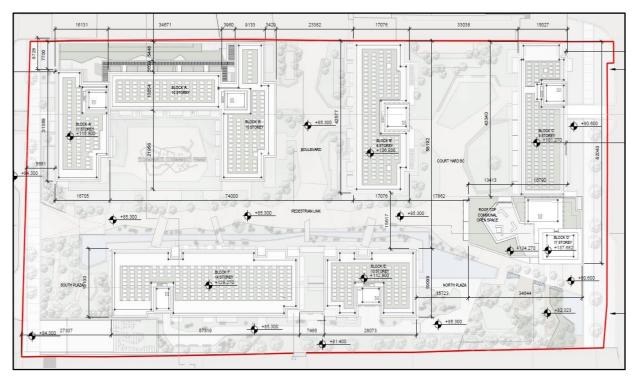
Proposed Site Layout Plan (Standalone Scaled Drawing is Provided - Drawing No.: SFC-HJL-ST-00-DR-A-1000)
